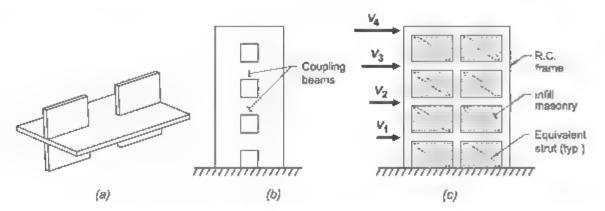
Coupled and infill walls. (a) shallow coupling beams or slabs. (b) coupling beams, and (c) infill walls.
